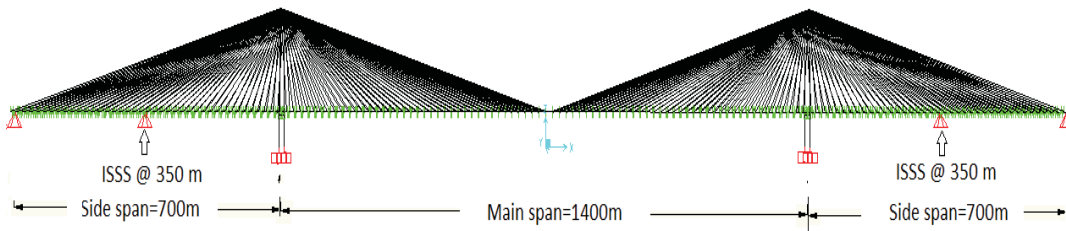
Cable stayed bridge with one ISSS in side span at 350m c-c
